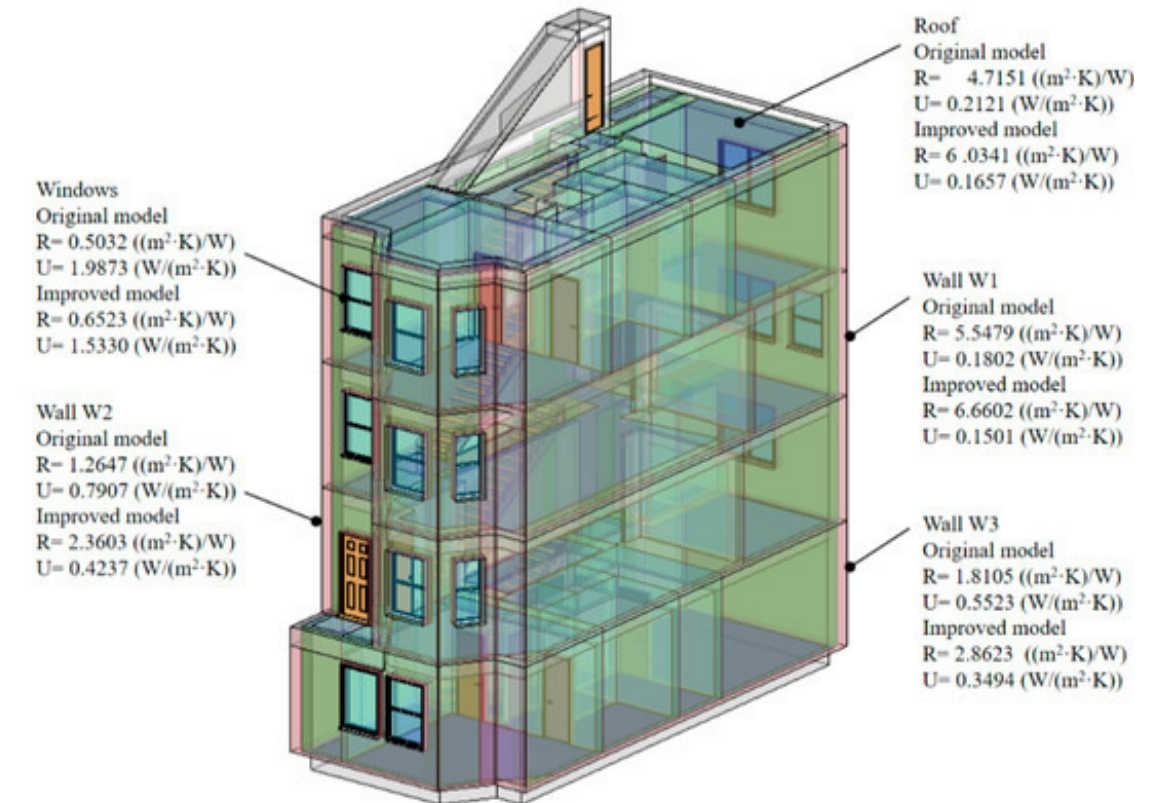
R and U values for townhouse renovation. Kaewunruen, et al., "Potential Reconstruction Design of an Existing Townhouse in Washington DC for Approaching Net Zero Energy Building Goal," *Sustainability*, 2019.
